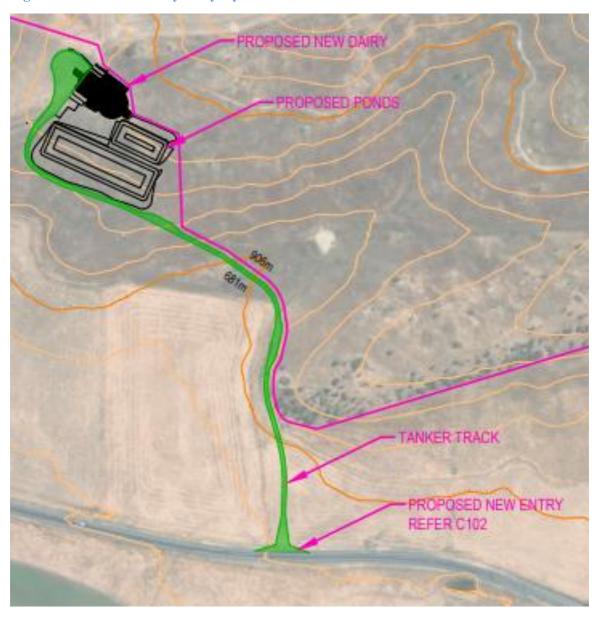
Revised Norley dairy layout and access (1.25km East of Ellendale Rd)
